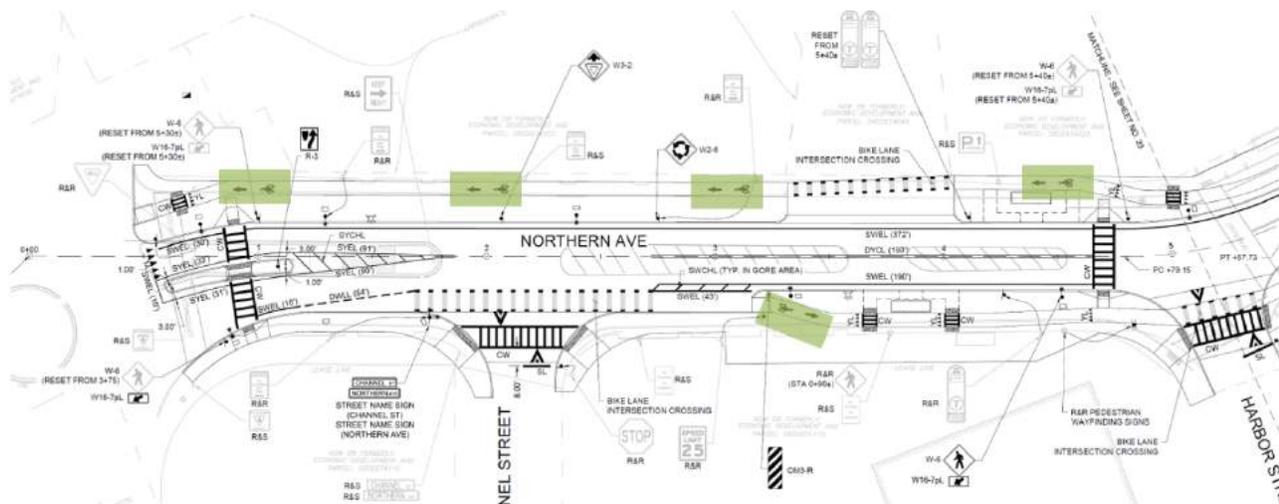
A reconstructed Northern Avenue between Tide Street and Haul Road/Fid Kennedy Avenue will feature dedicated bicycle facilities, pulling bike/ped traffic from the more industrial-oriented Fid Kennedy Avenue (source: BPDA)
